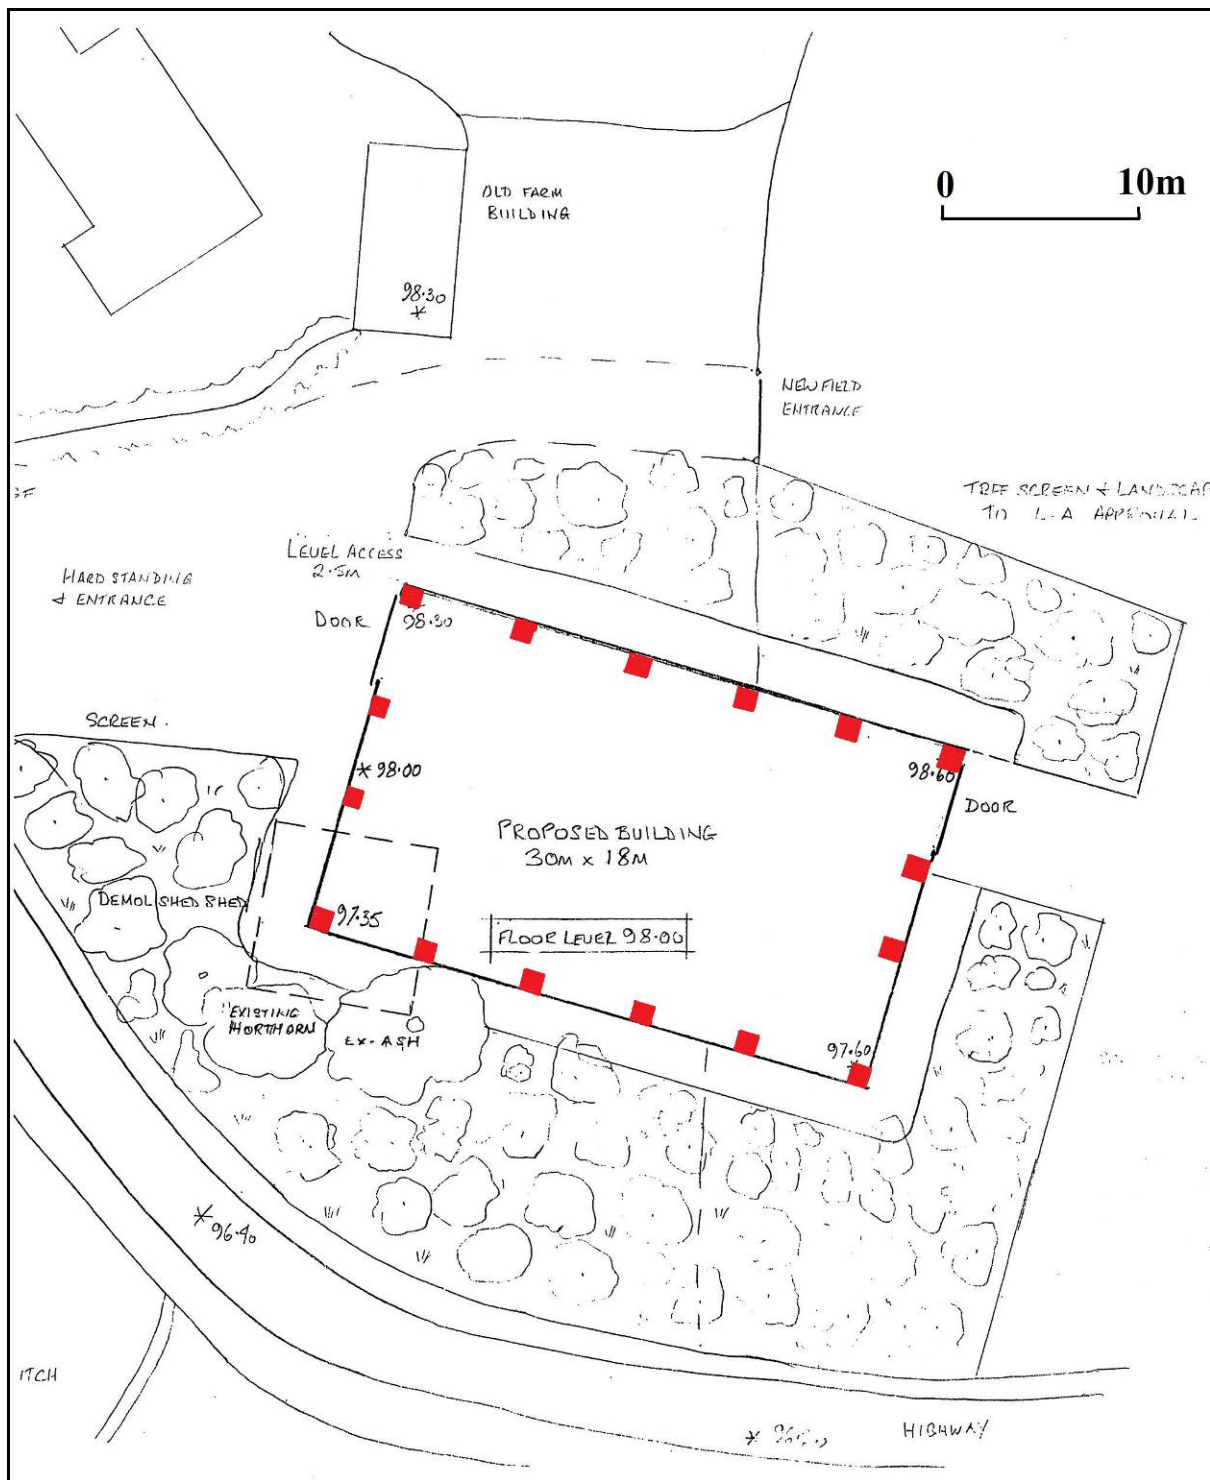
Float Farm, Udimore: Site plan showing location of the proposed building and the position of the holes to be excavated (in red)
